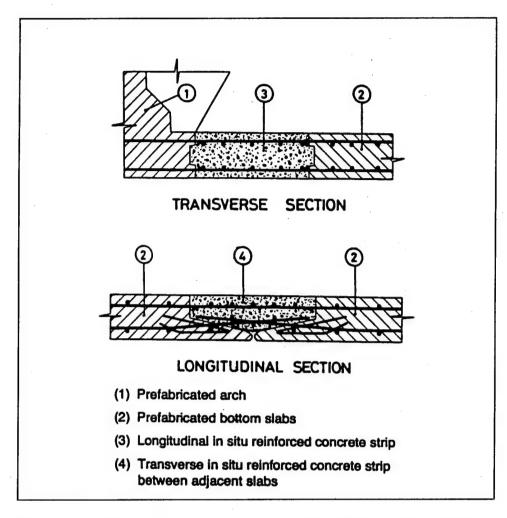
Details of transverse and longitudinal sections, Maria Christina Bridge (from Mainar and Arenas 1986)
